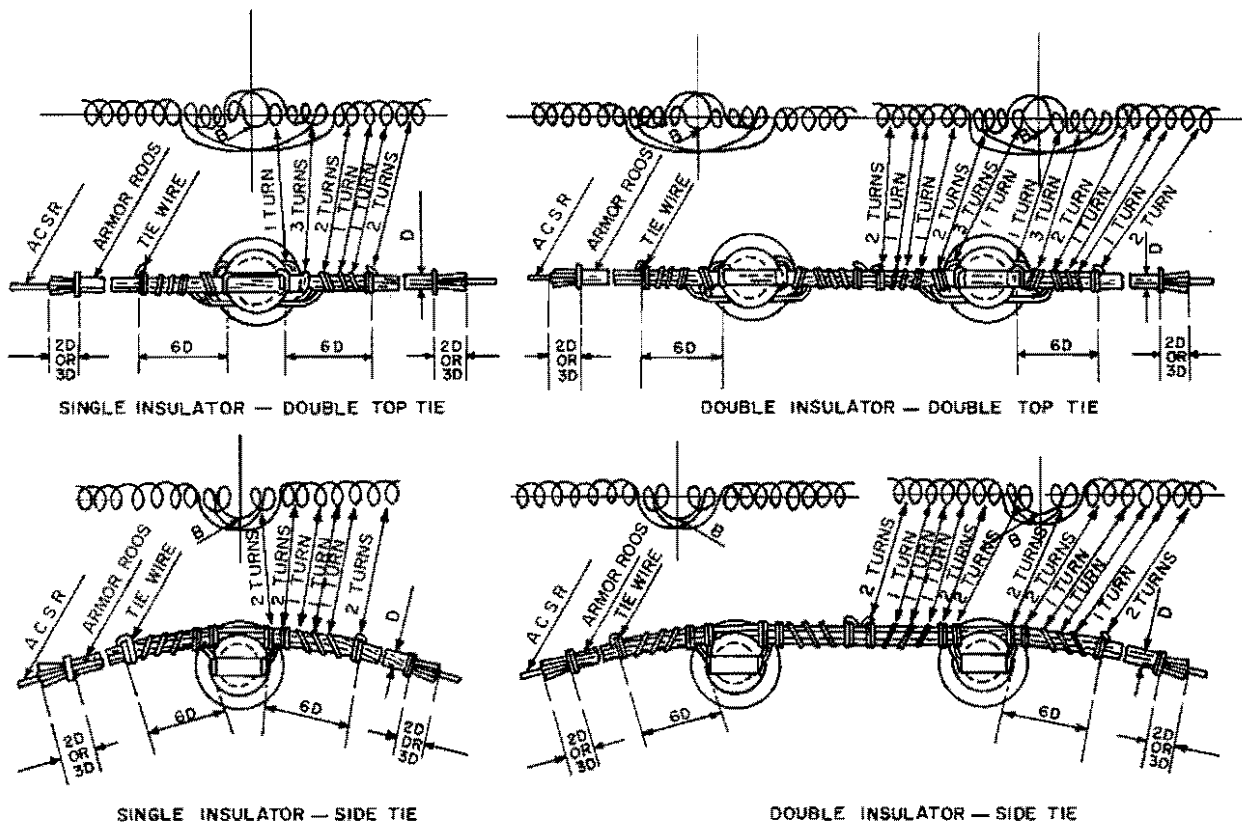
Arrangement of tie wires for attaching a cable to pin-type insulator.
